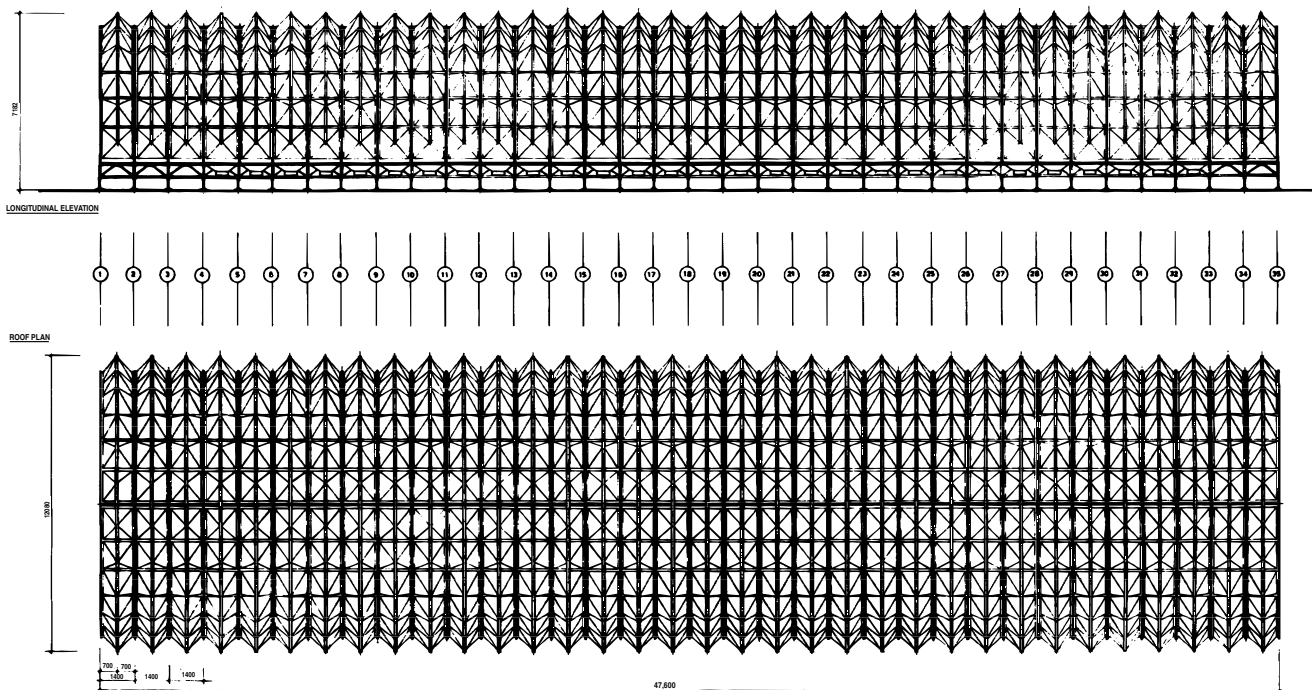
Elevation and roof plan of the IBM pavilion, 1983.
